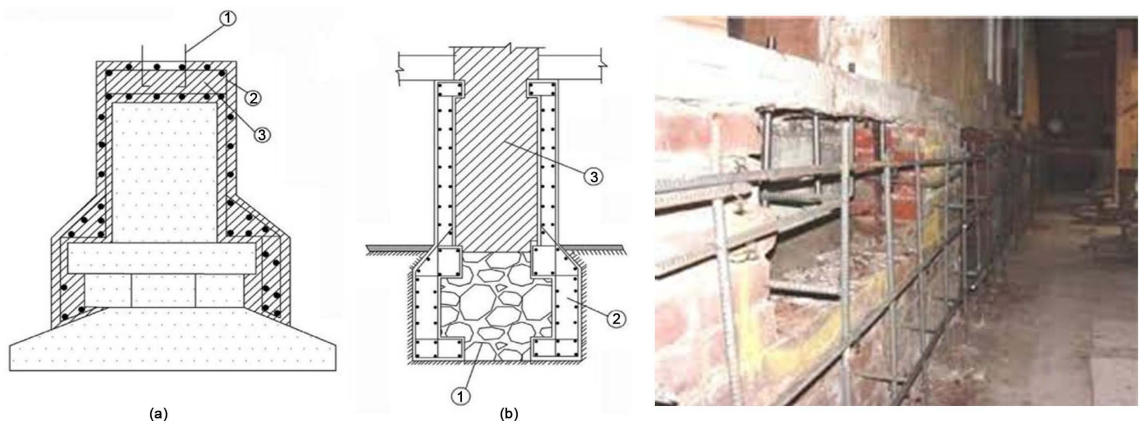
Proposal for reinforcement of brick (stone) foundation-continued. In Figure 3: (a) is Solutions to reinforce the foundation without expanding the bottom of the foundation 1—bolts; 2—welded wire mesh; 3—coat texture; (b) is Solutions to reinforce the foundation with widening of the bottom of the foundation: 1—foundation; 2—reinforced wrapping structure; 3—foundation wall.
